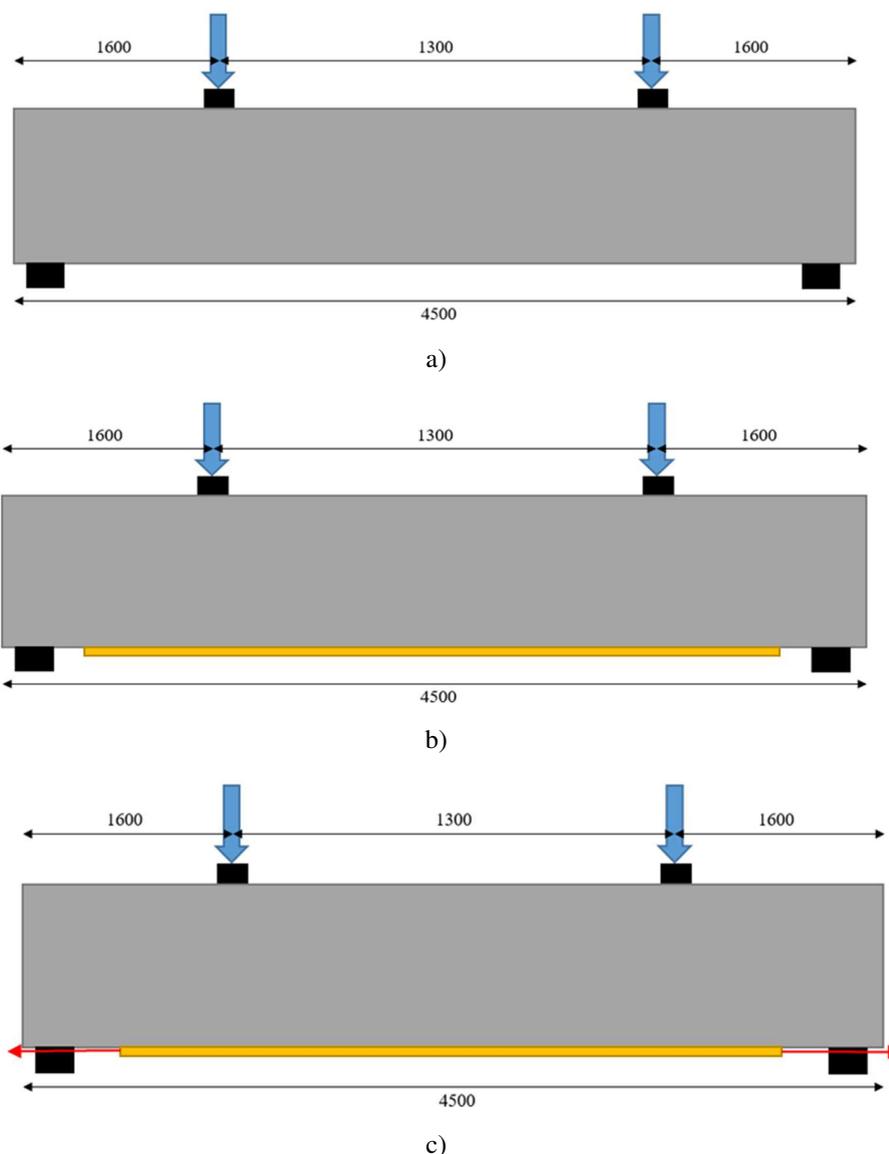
a) Beam 1; b) Beam 2; c) Beam 3
